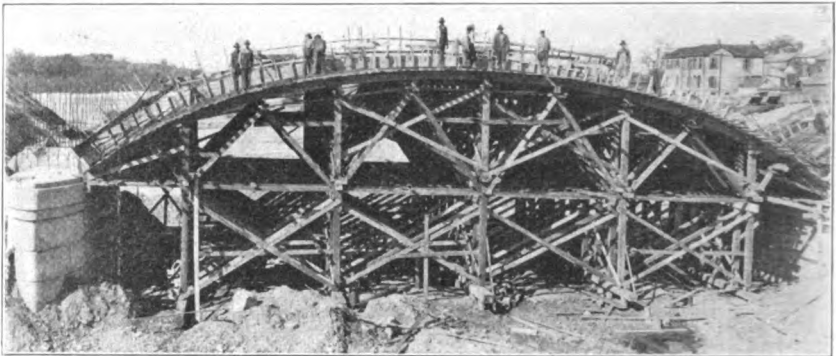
VIEW OF ONE SPAN OF COMPLETED FALSE WORK OF BLACK STREET BRIDGE IN PLACE
